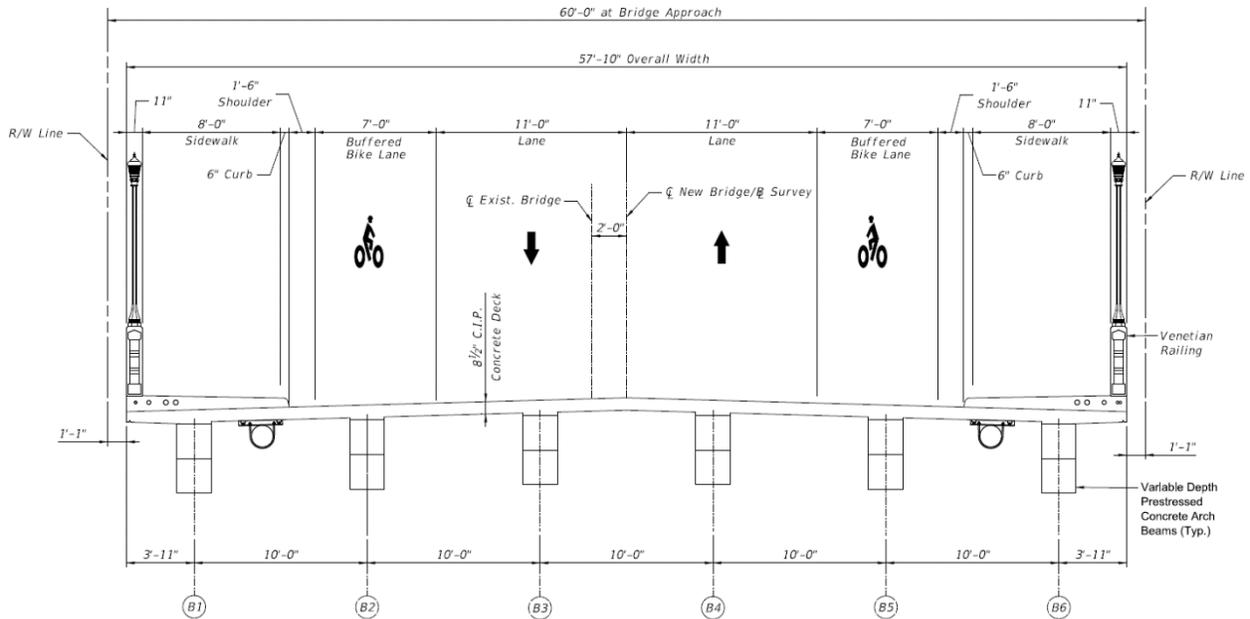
Replacement Alternative 7: Arched Beam Typical Section
